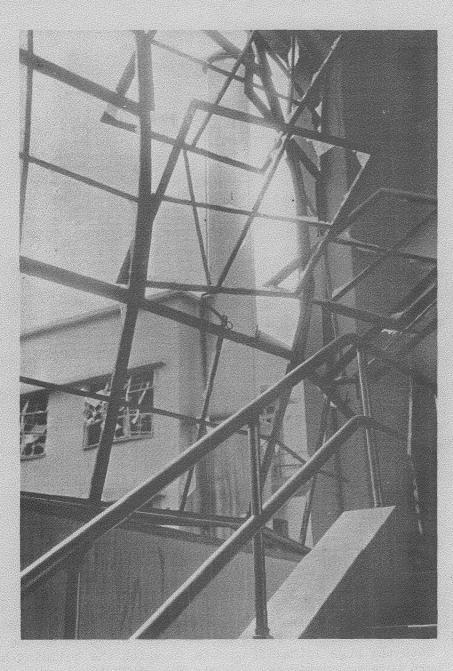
(3H). Broken window frames at the Japan Red-Cross Hospital, Hiroshima (1600 meters). Direction of pressure wave indicated by bulging of the window frames. Note jagged fragments of glass that produced many of the injuries, particularly in these concrete buildings. (Photo File # EH 109.)
